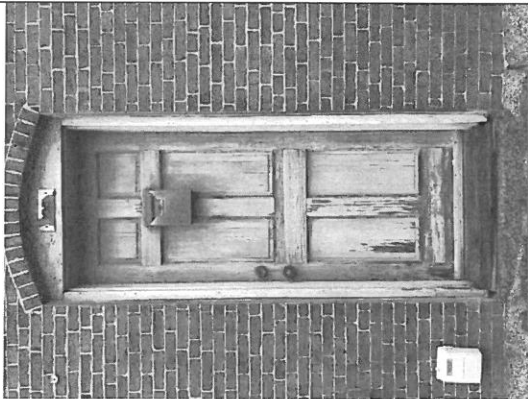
Door A showing damage to the lower frame of the glazed window panel.
